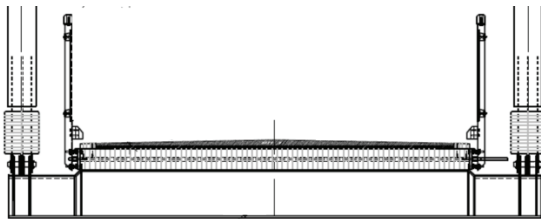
Typical solution based on stress laminated deck and beams suspended under the lower chord
